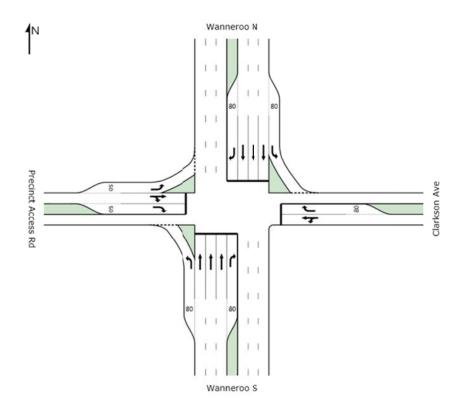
Proposed Intersection Layout for 2025 (Long Term)
